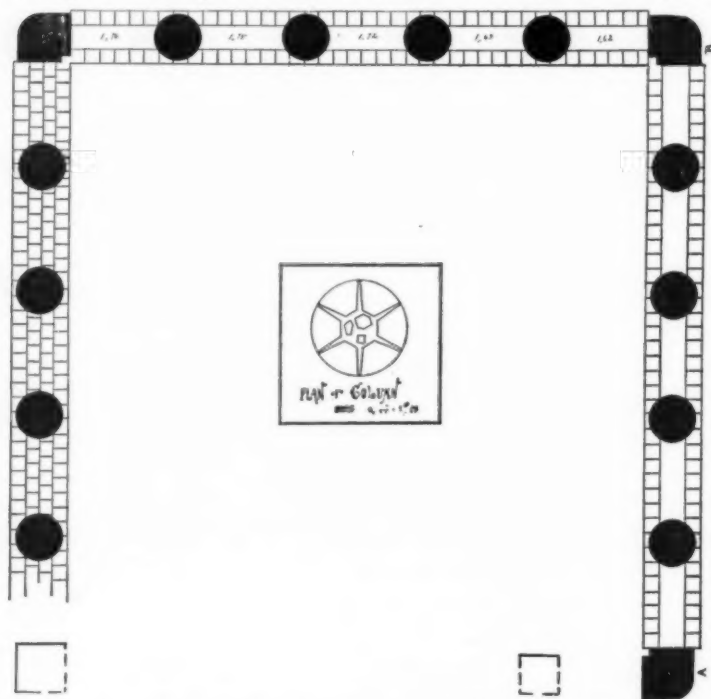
COURT OF COLUMNS. EXCAVATIONS OF 1889. SCALE, .008 M. = 1 M.
